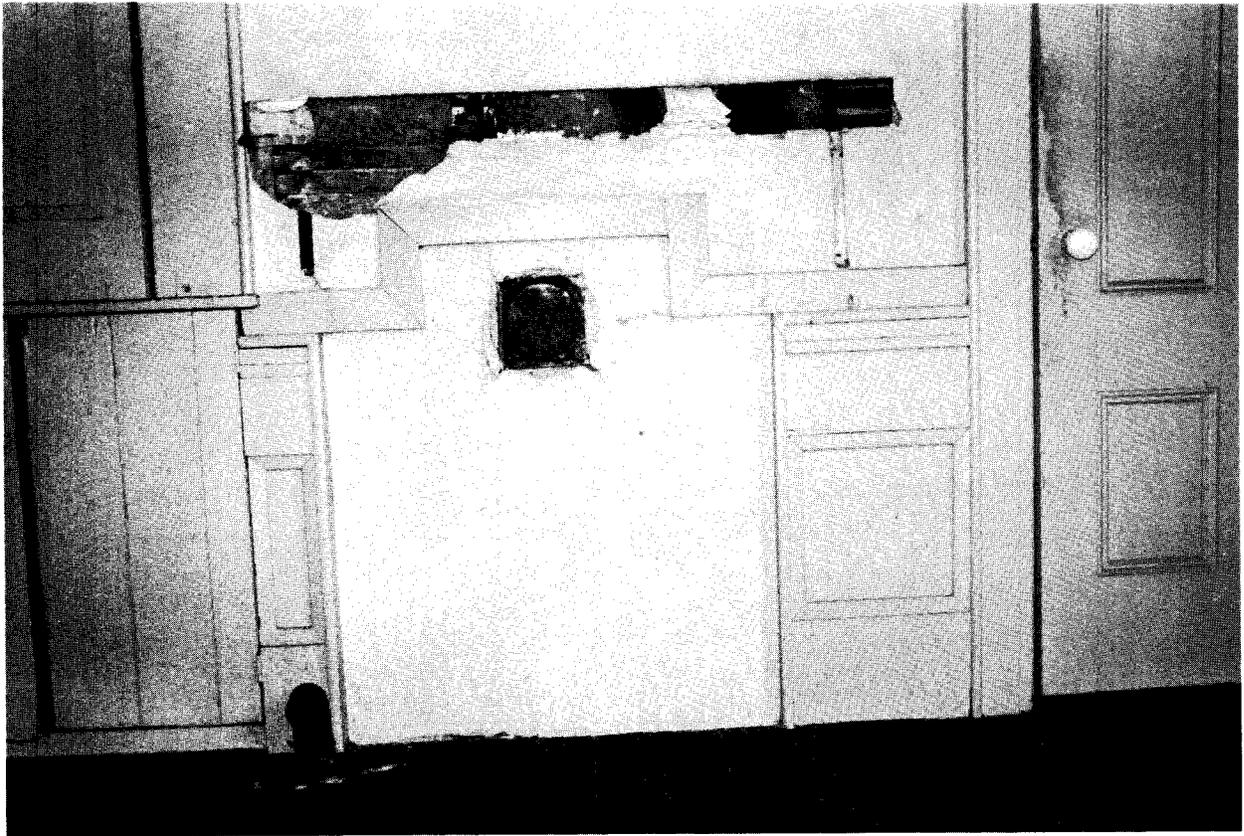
Penniman House: Kitchen (Room 104), West Wall, Showing Later Lower Cupboard and Former Location of Mantelshelf (1984).
